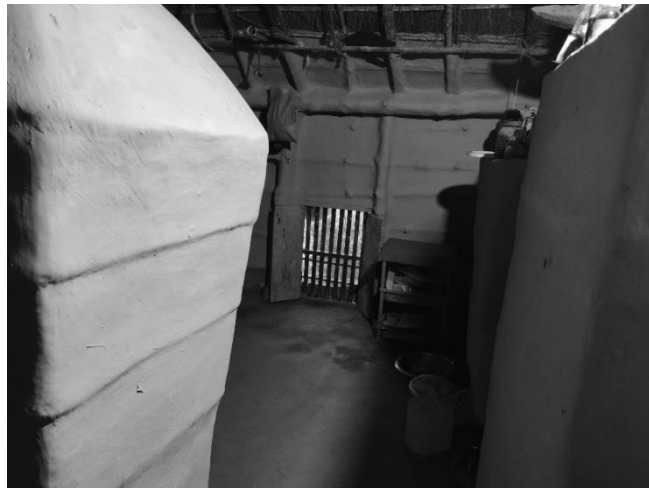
Wall Plaster Applied to the roof lower end to seal gaps
